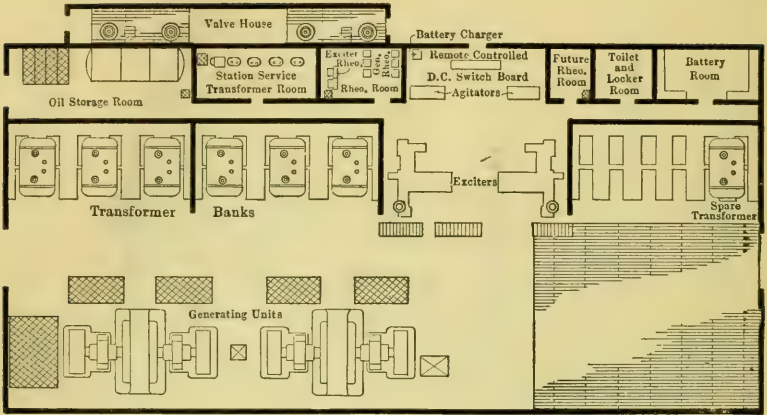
A.—Floor Plan of Big Creek Power-house No. 1. Southern California Edison Company. (For cross-section see Fig. 98.)
